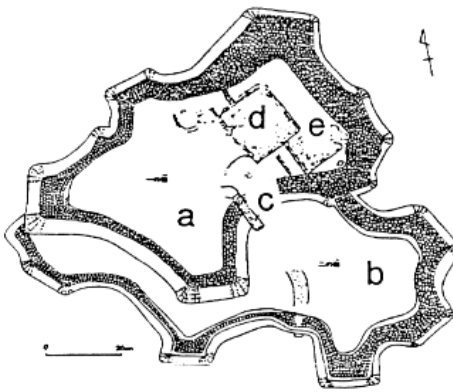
Plan of Zakimi Gusuku. (from Okinawa Ken 1983:77). a) Enclosure No. 1; b) Enclosure No.2; c) arched entrance to Enclosure No. 1; d) Palace No. 1; e) Palace No.2.
